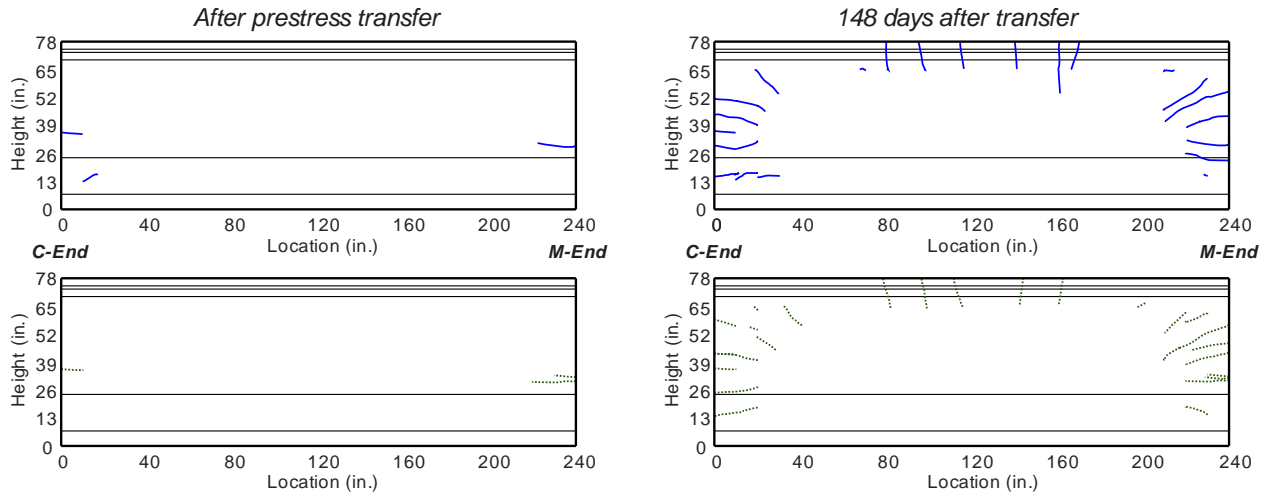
SH-70 Crack patterns shown on North face of specimen. Solid blue lines depict cracks visible on the North face and dashed green lines depict cracks visible on the South face.
